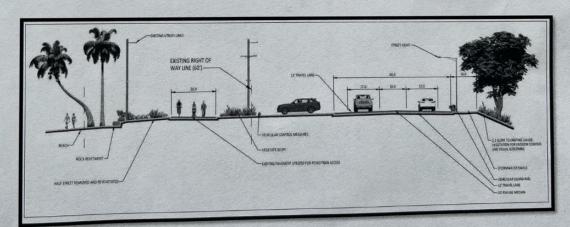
Pedestrian Shift Alternative Alignment Typical Section
